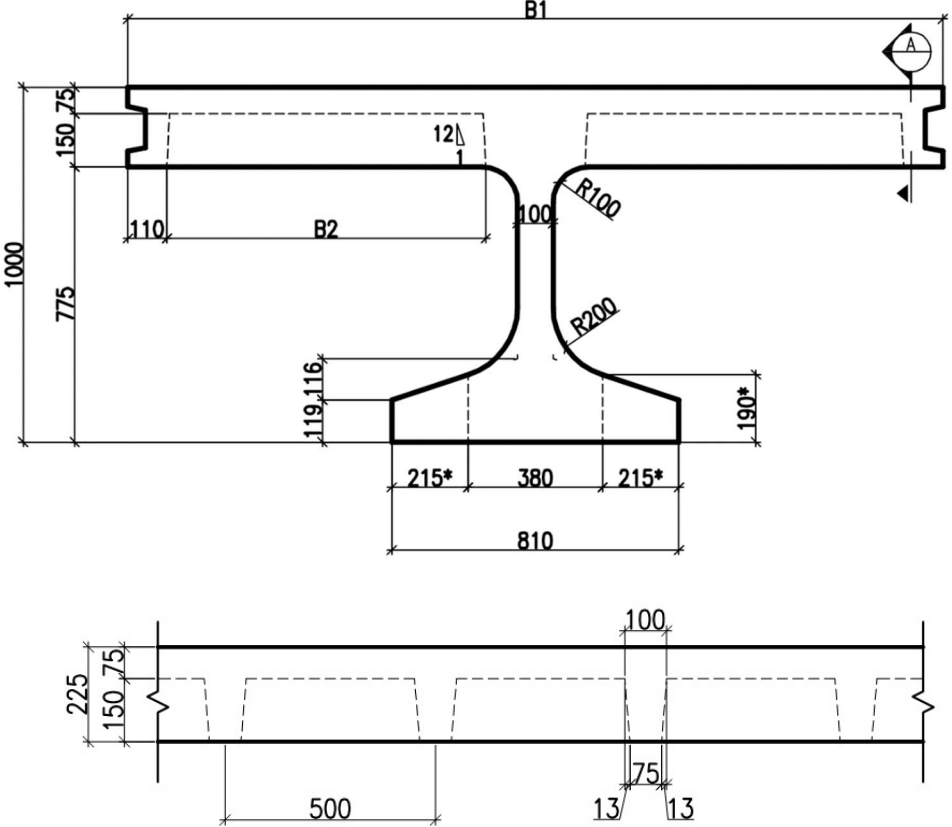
Cross Section of UHPC Decked I-Beam Fabricated in Ontario, Canada
